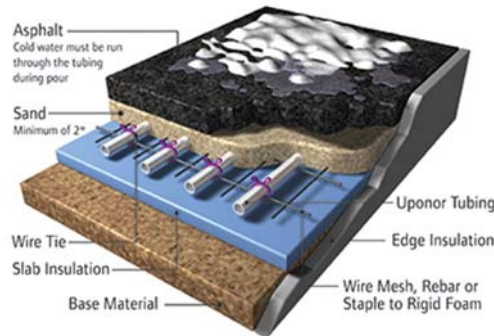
Snow melting system beneath asphalt concrete pavement (Uponor, 2010).
